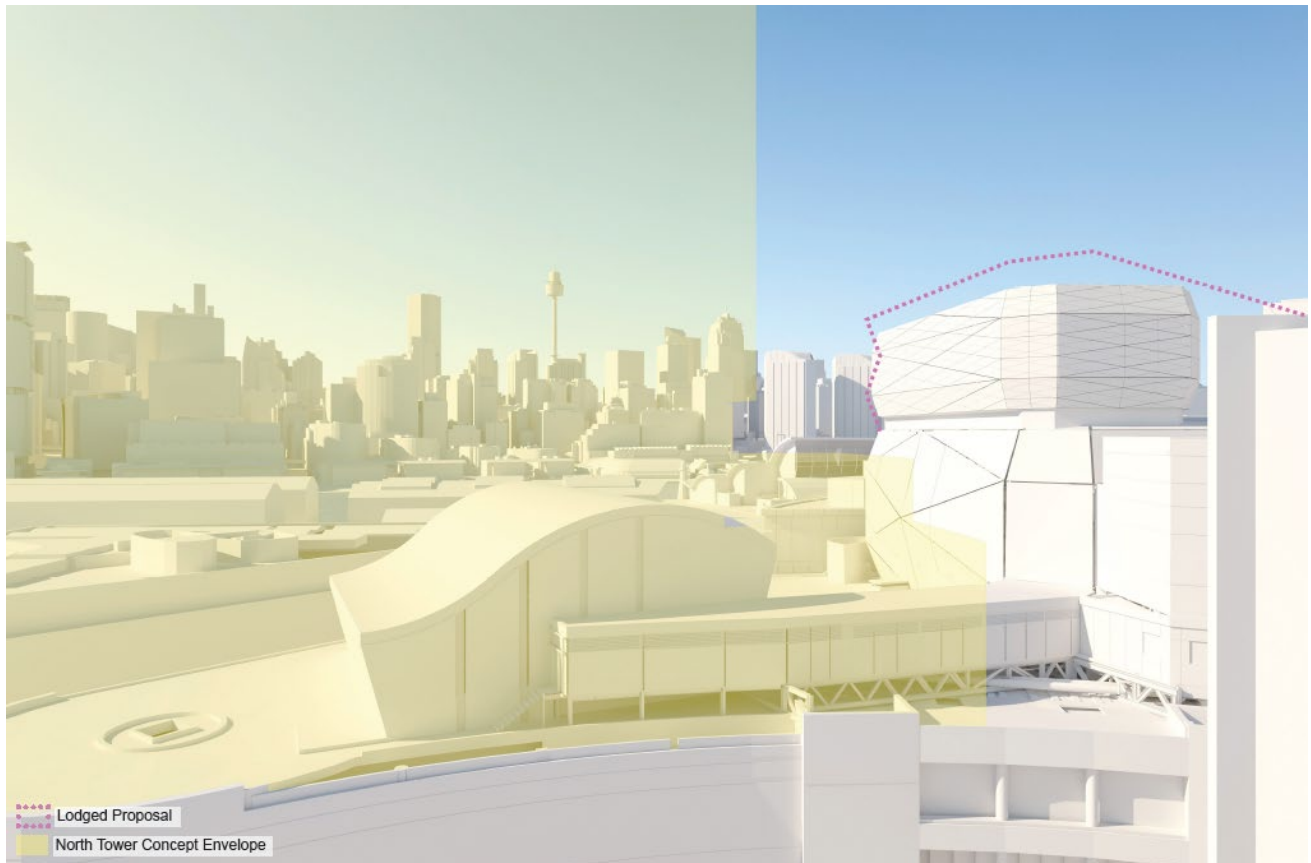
CAM14: Watermark Pavilion, central section, 8th storey, comparison between original and revised proposal
